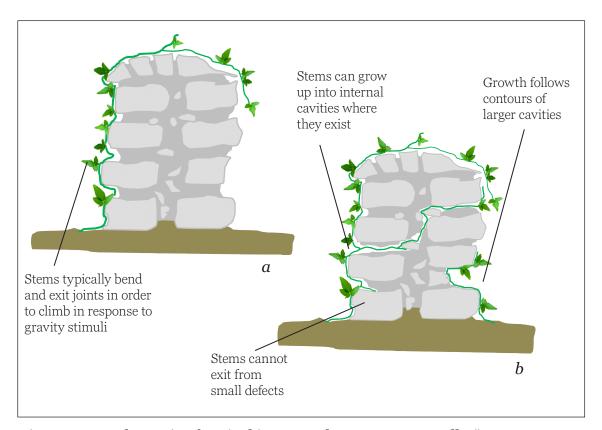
Schematic of typical ivy growth on masonry walls (in cross-section): (a) wall with recessed but otherwise good condition mortar and pointing; (b) deteriorating wall with internal cavities.
